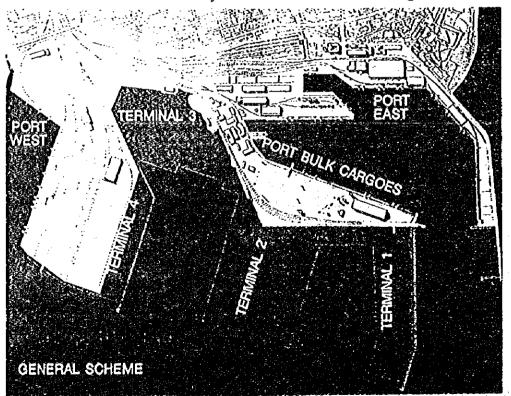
Future Layout of the Terminals in Bourgas Port
